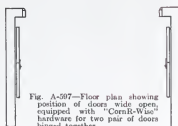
Floor plan showing position of doors wide open, equipped with "CornR-Wise" hardware for two pair of doors hinged together.
